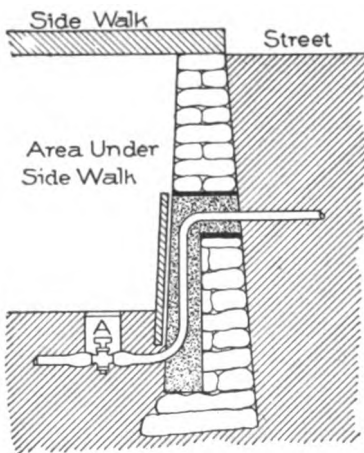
One Method of Protecting Service Pipes from Frost. Pipe Carried through Wide Channel in Wall and Packed in Mineral Wool.
